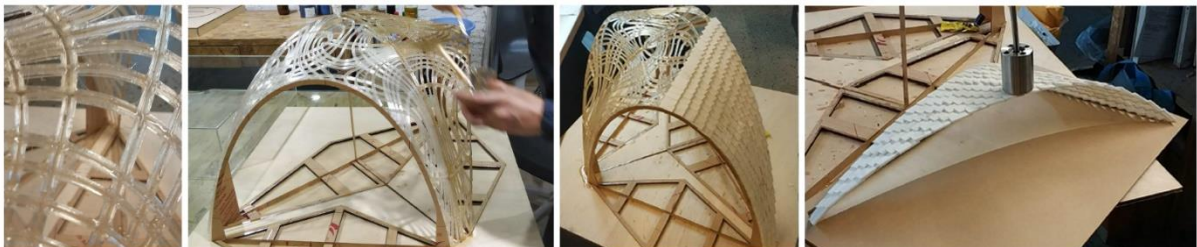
The process of 3D printing the stress lines, resining, constructing the stone shell and applying a load of 1kg (Zhang et al., 2019)
